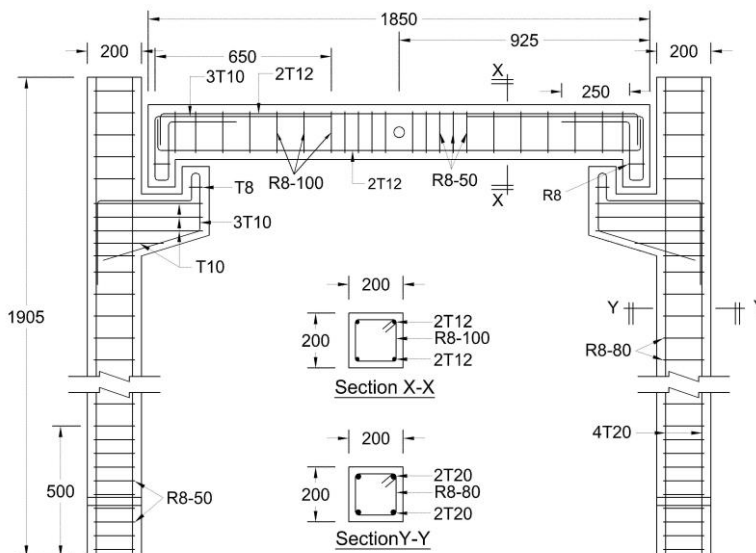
Reinforcement detailing of precast frame with U-shaped HDR beam-column joint.
